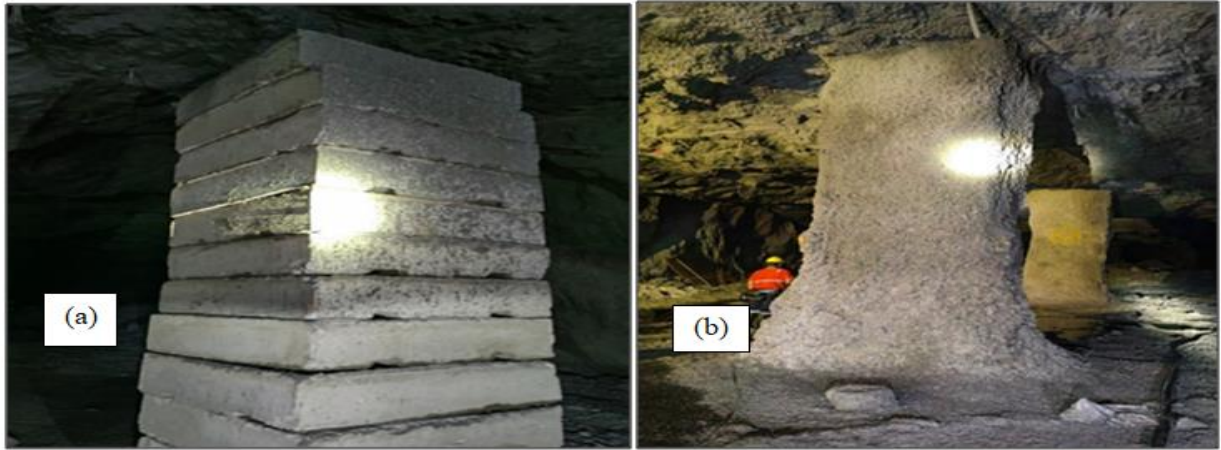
Artificial pillar installation after packing (a) and after shotcreting the pillars (b)
